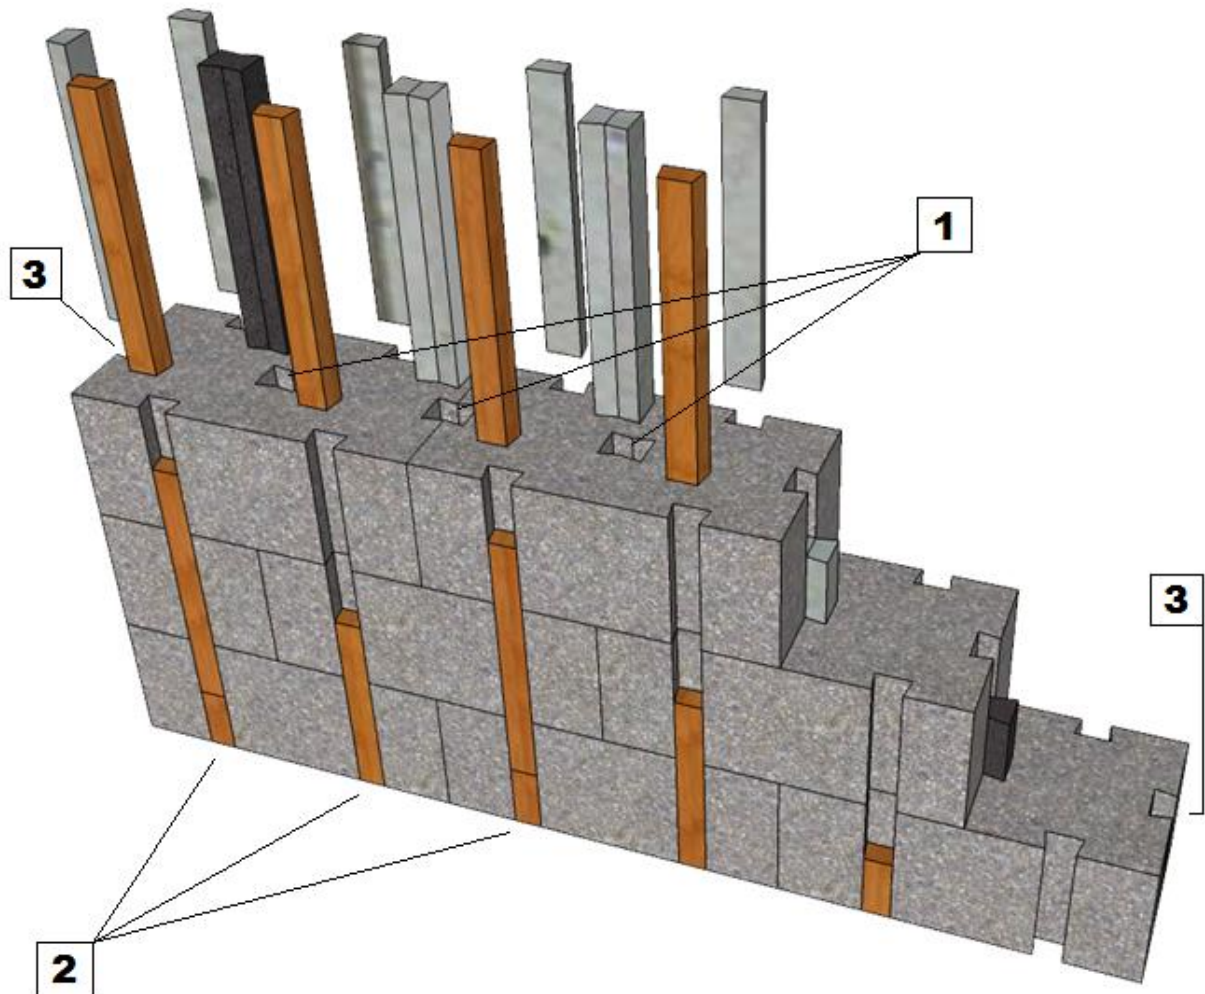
Recommendations for layout of the vertical elements in test specimens
